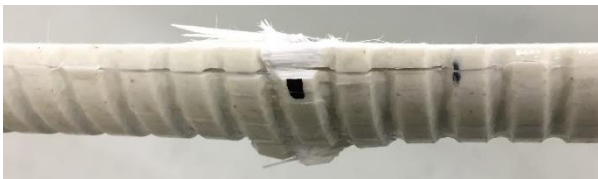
Close-up View of Side Face of M15 Specimen Subjected to 4-Point Bending
